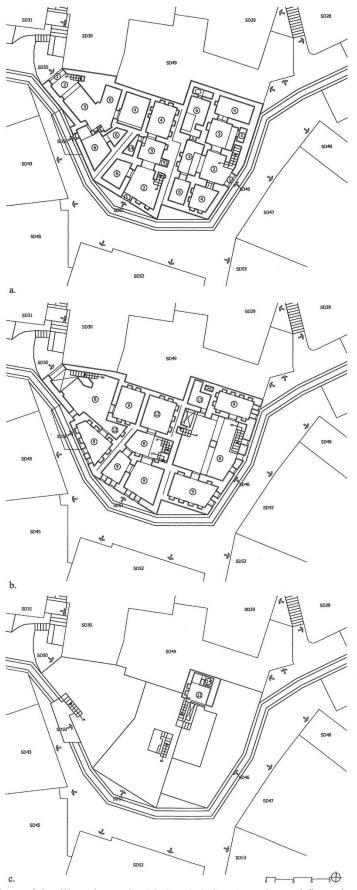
Floor plans of dwelling cluster SD46, SD50 & SD51; *a*. Ground floor; *b*. First floor; *d*. Roof and second floor; 1. main entrance door; 2. First *dahreez*; 3. Second *dahreez*; 4. *suffah*; 5. *caqid*; 6. *darss*; 8. *carshah*; 9.*gurafah*; 11. Kitchen store ; 12. Kitchen; 14. Latrine.
